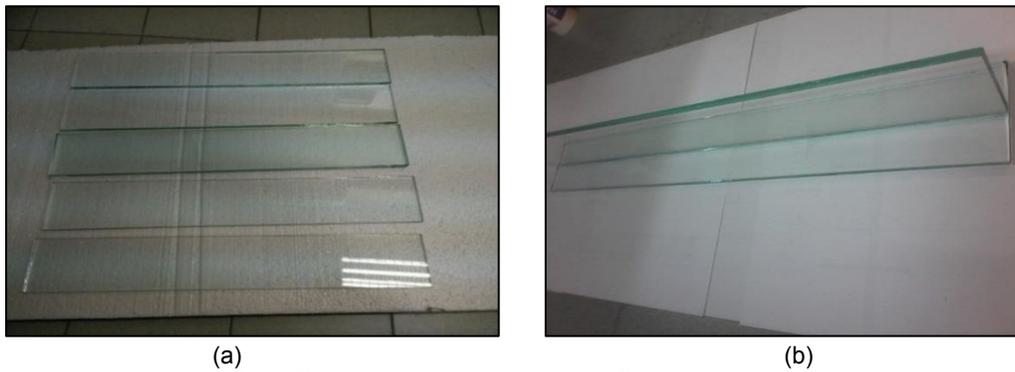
(a) Glass fins specimens, and (b) Glass T-beam specimen
